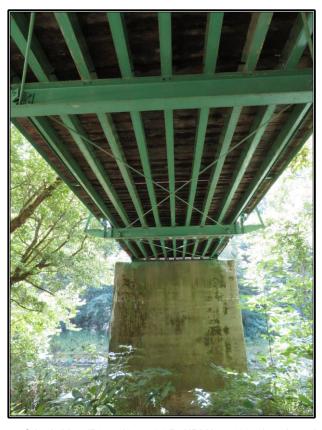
Substructure of the bridge (P000-40-07088 B; NBI No. 060380) and north pier, looking south.
